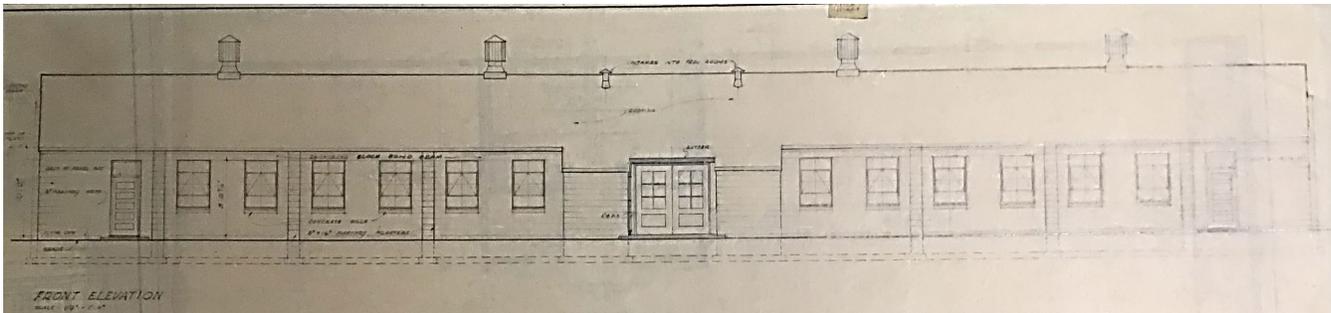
1953 architectural drawing of the primary elevation of a typical Support Services Building, the design used for Beach Hall (CSUMB Facilities 2021)
